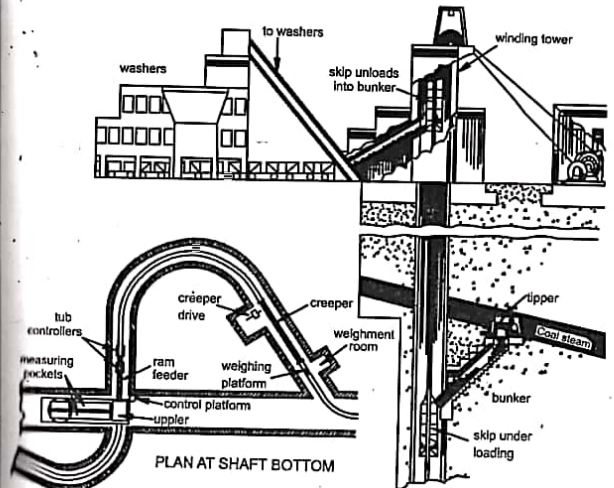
General arrangement at the pit top and pit bottom loading point
